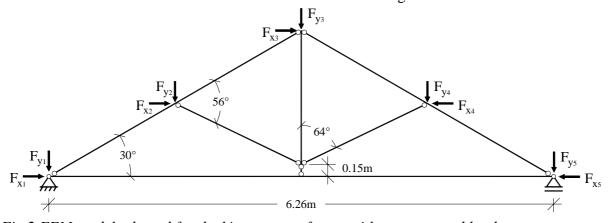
FEM model adopted for the king post roof truss with concentrated loads
